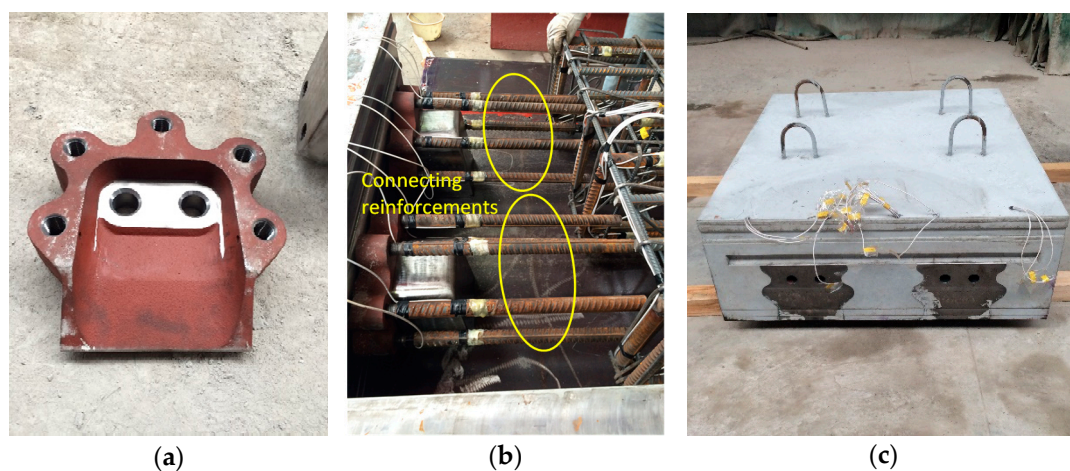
Tested segments: (a) ductile iron joint panel (DIJP); (b) connecting reinforcements; (c) segment after curing.
